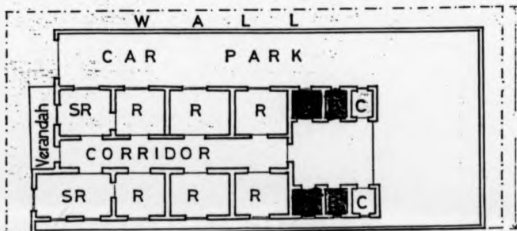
Plan of a Face-Me-I-Face-You Building
